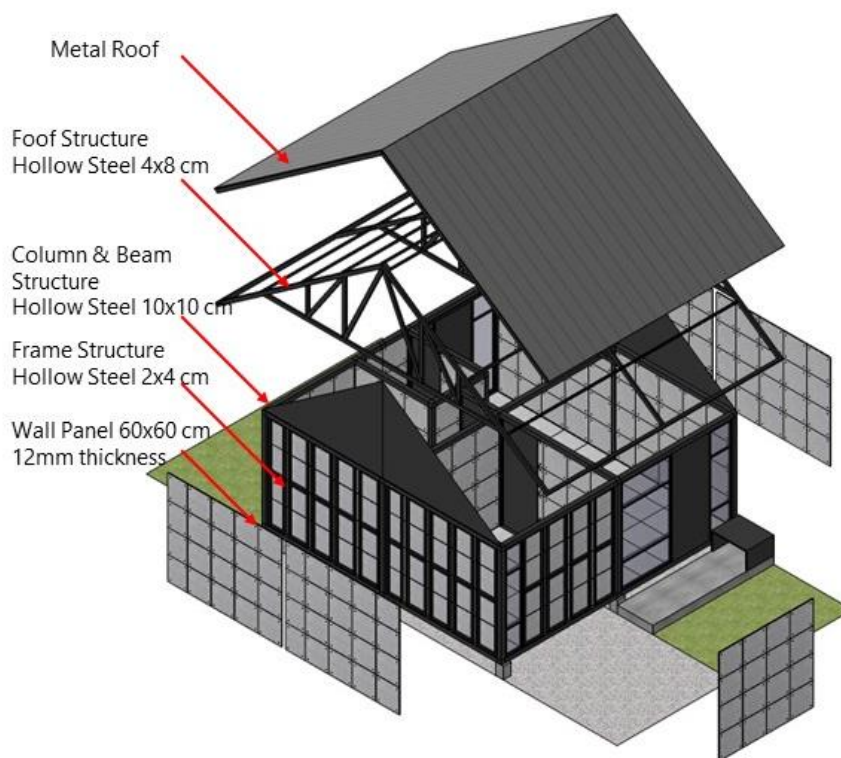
Exploded Axonometry of Prefabricated Low-Cost Housing Prototype Design
